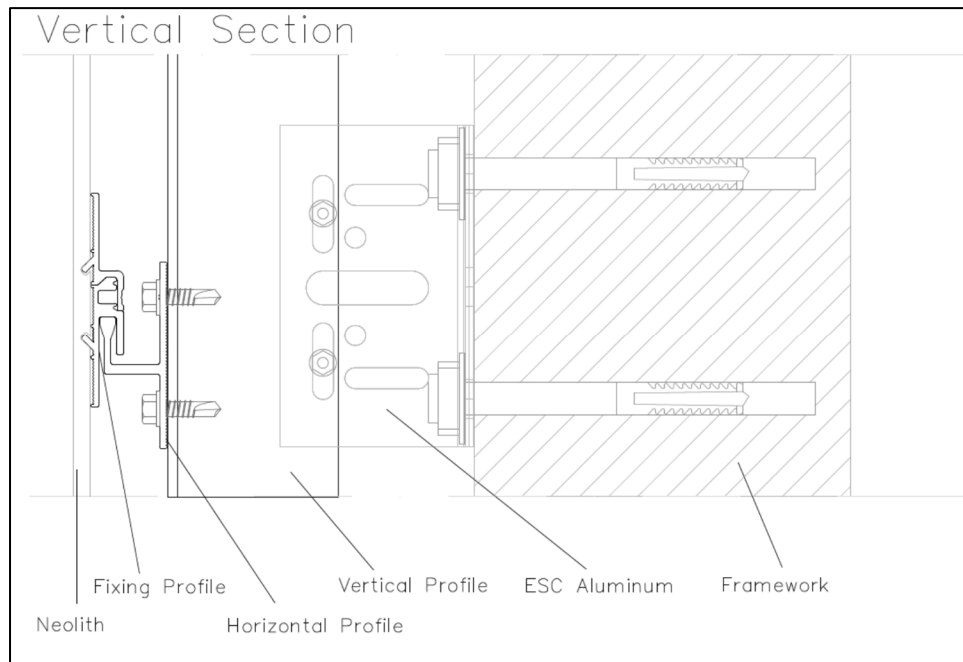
VERTICAL CROSS SECTION OF ASSEMBLY OF STRONGFIX SYSTEM COMPONENTS
